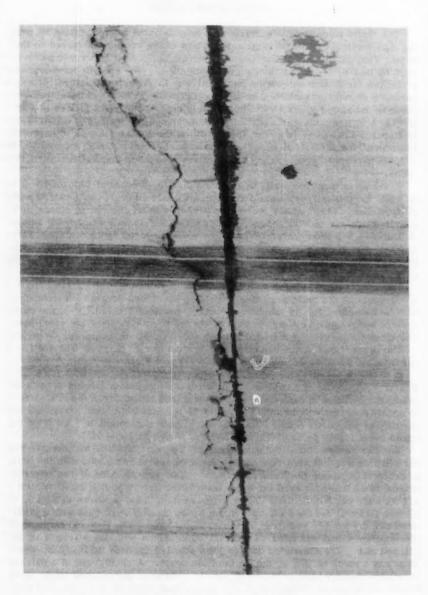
PAVEMENT FAILURE NEAR CONTRACTION JOINT
